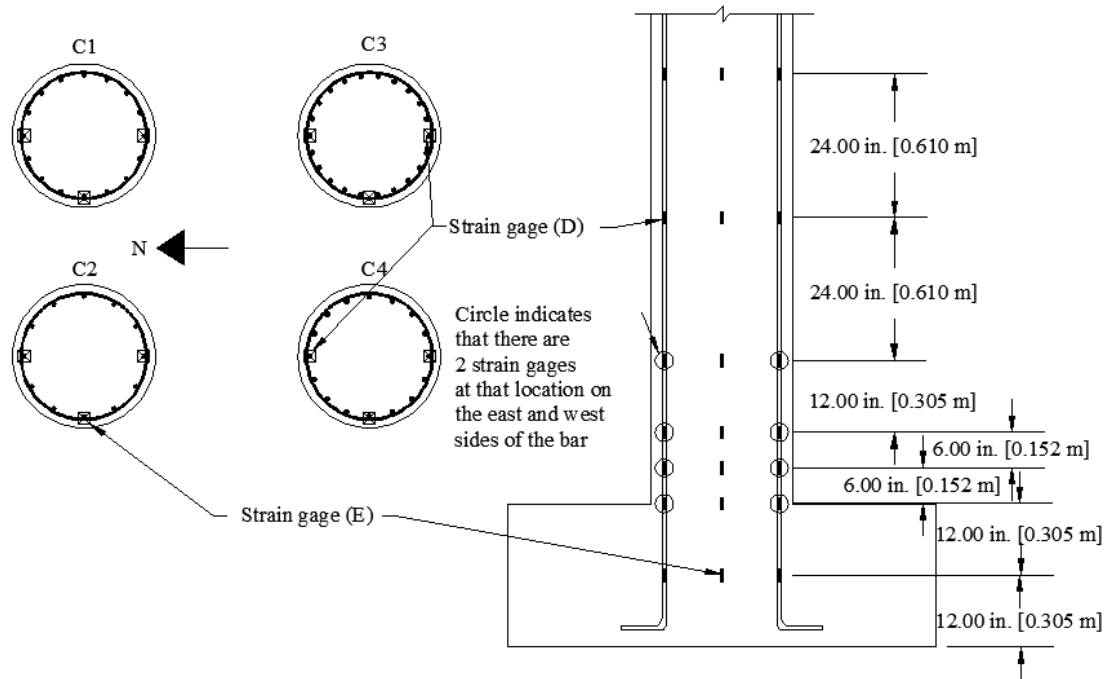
Column C1, C2, C3, and C4 internal instrumentation
